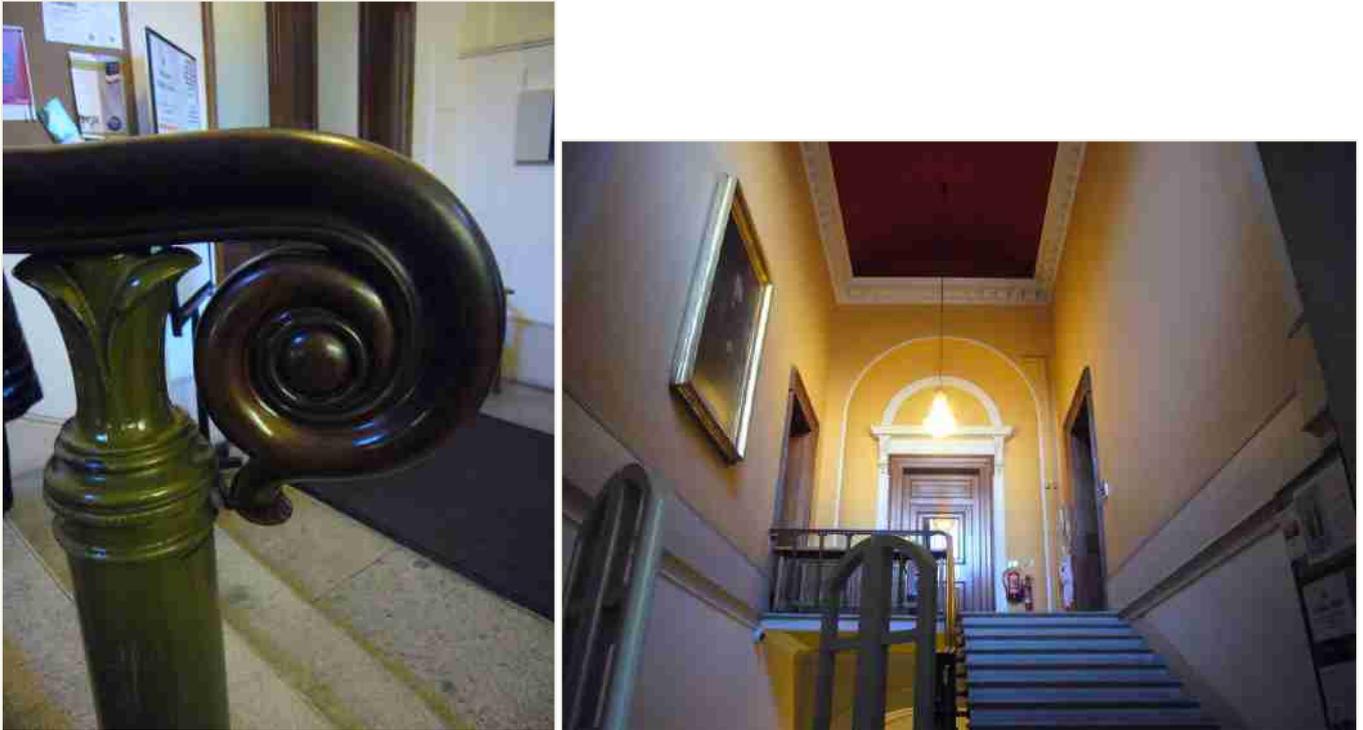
Left, Iron newel and wooden handrail in Entrance Hall. Right, first-floor landing looking south
